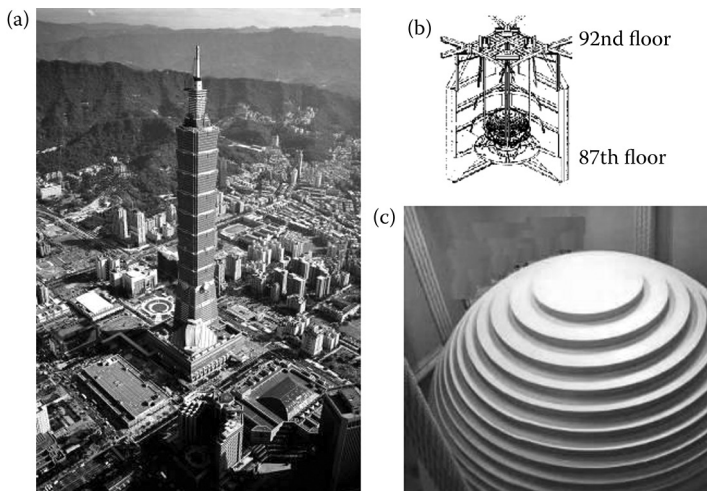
2004 Taipei 101 Tower: (a) View of the Tower; (b) tuned mass damper system; (c) detail of the mass.
